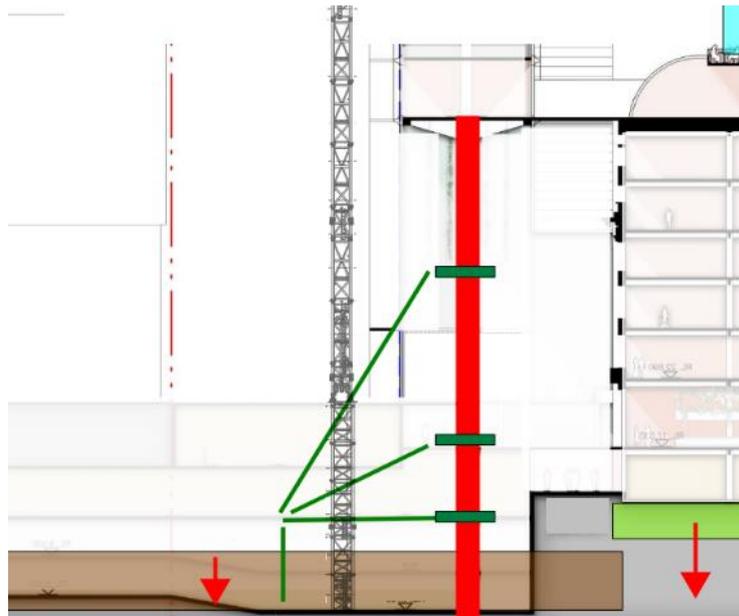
Elevation view of HDP megacolumn installation
